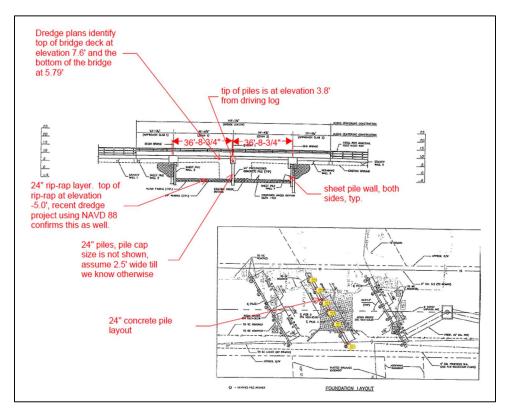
As-built Plan for RF11461 Crossing Over Bear Creek at La Plaza Avenue South
